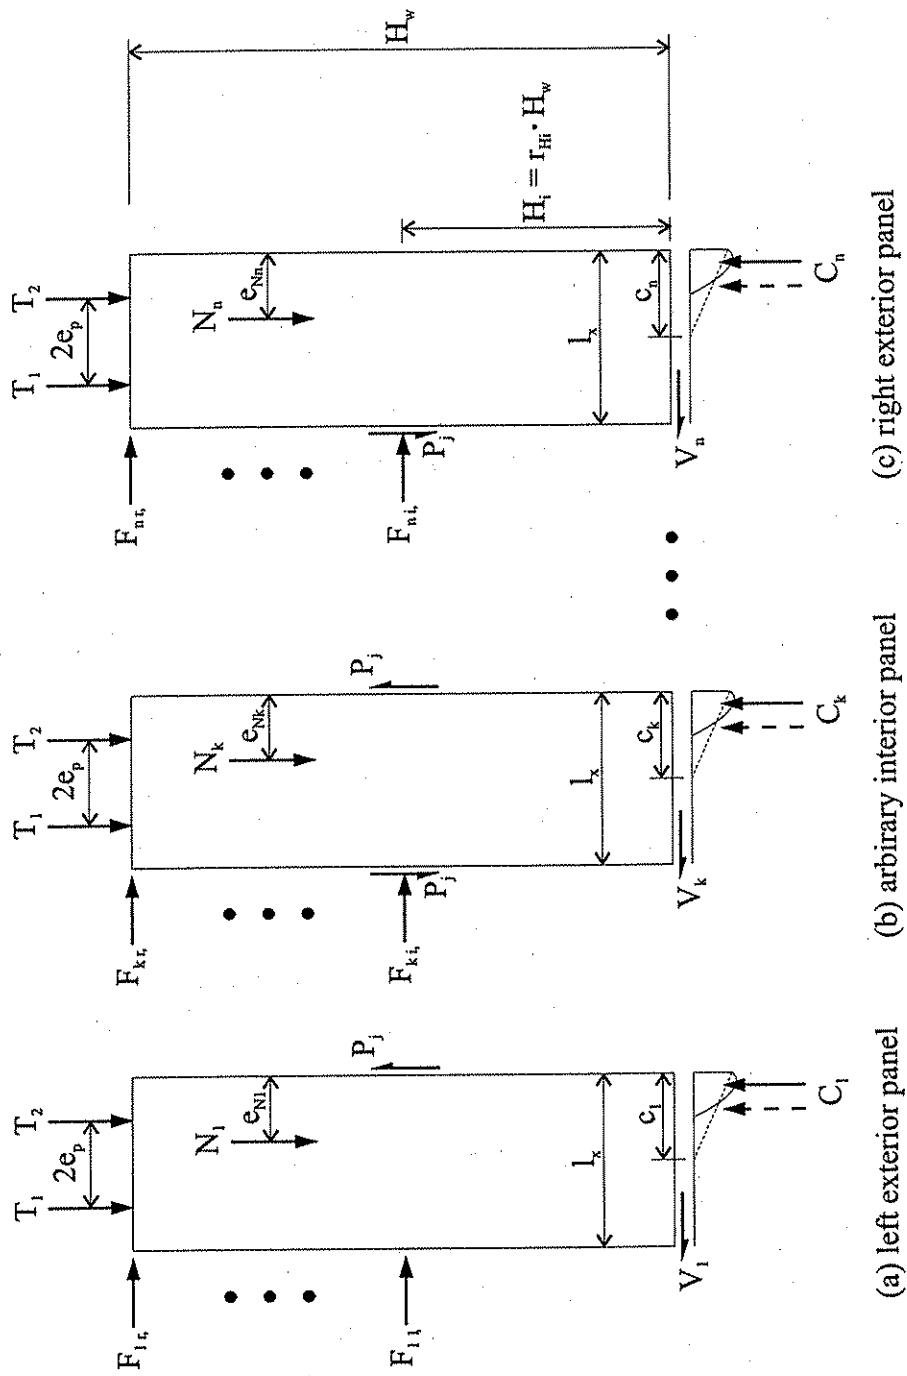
Forces on each panel of an unbonded post-tensioned precast concrete wall.
